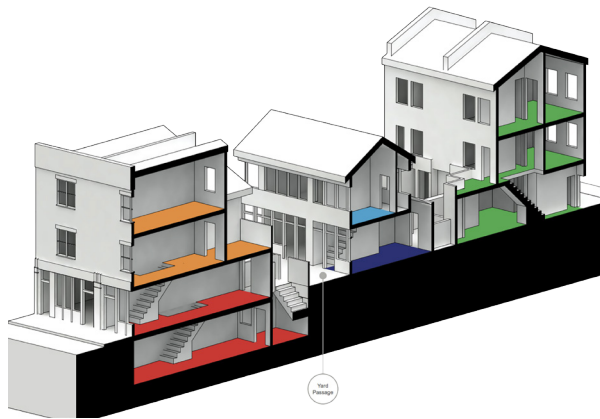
Axonometric showing section from Temple Street (left) to Canrobert Street (right) with workshop building in middle.
